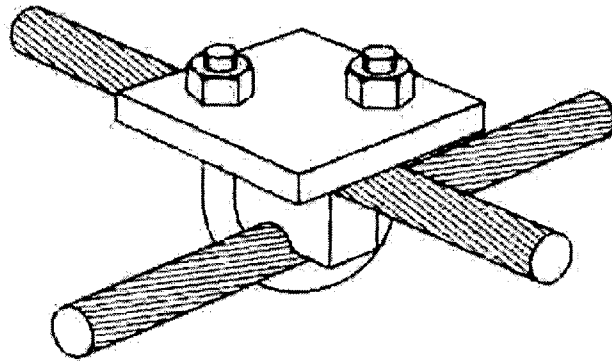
Single cable connection using U-bolt (Buchholdt pg. 271).
